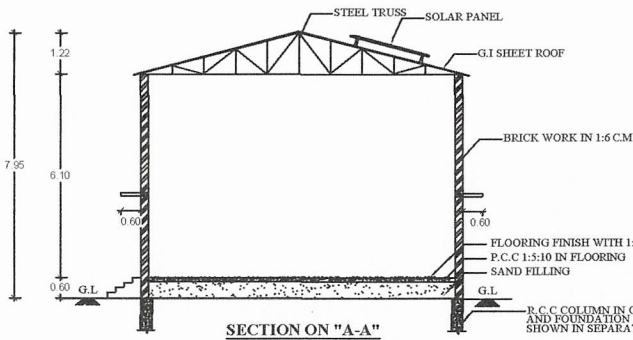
DETAILED PLAN SHOWING THE PROPOSED CONSTRUCTION OF G.I SHEET ROOF GREEN CATEGORY "SUG TRADERS" DHAL INDUSTRIAL BUILDING, IN S.F.No. - 116/6, AT VARAPALAYAM VILLAGE / VILLAGE PANCHAYAT, PERUNDURAI TALUK, ERODE DISTRICT.
